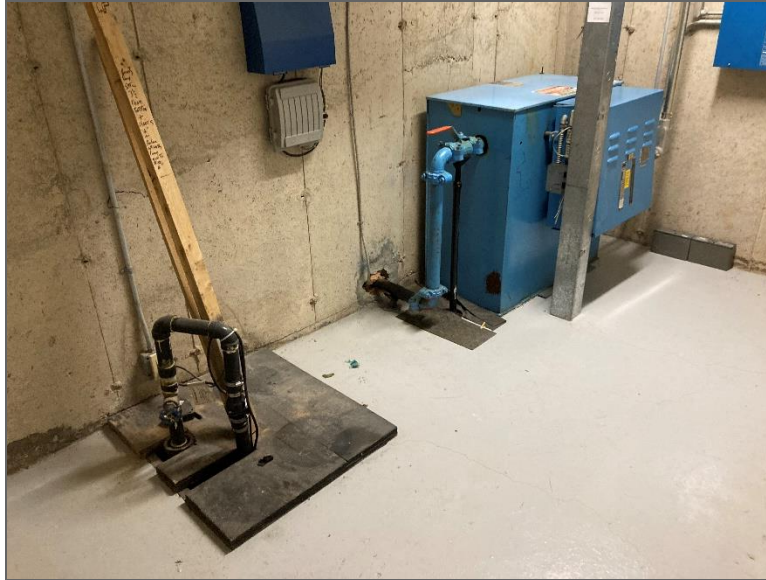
View of elevator mechanical room located in the basement of the Site Building.
